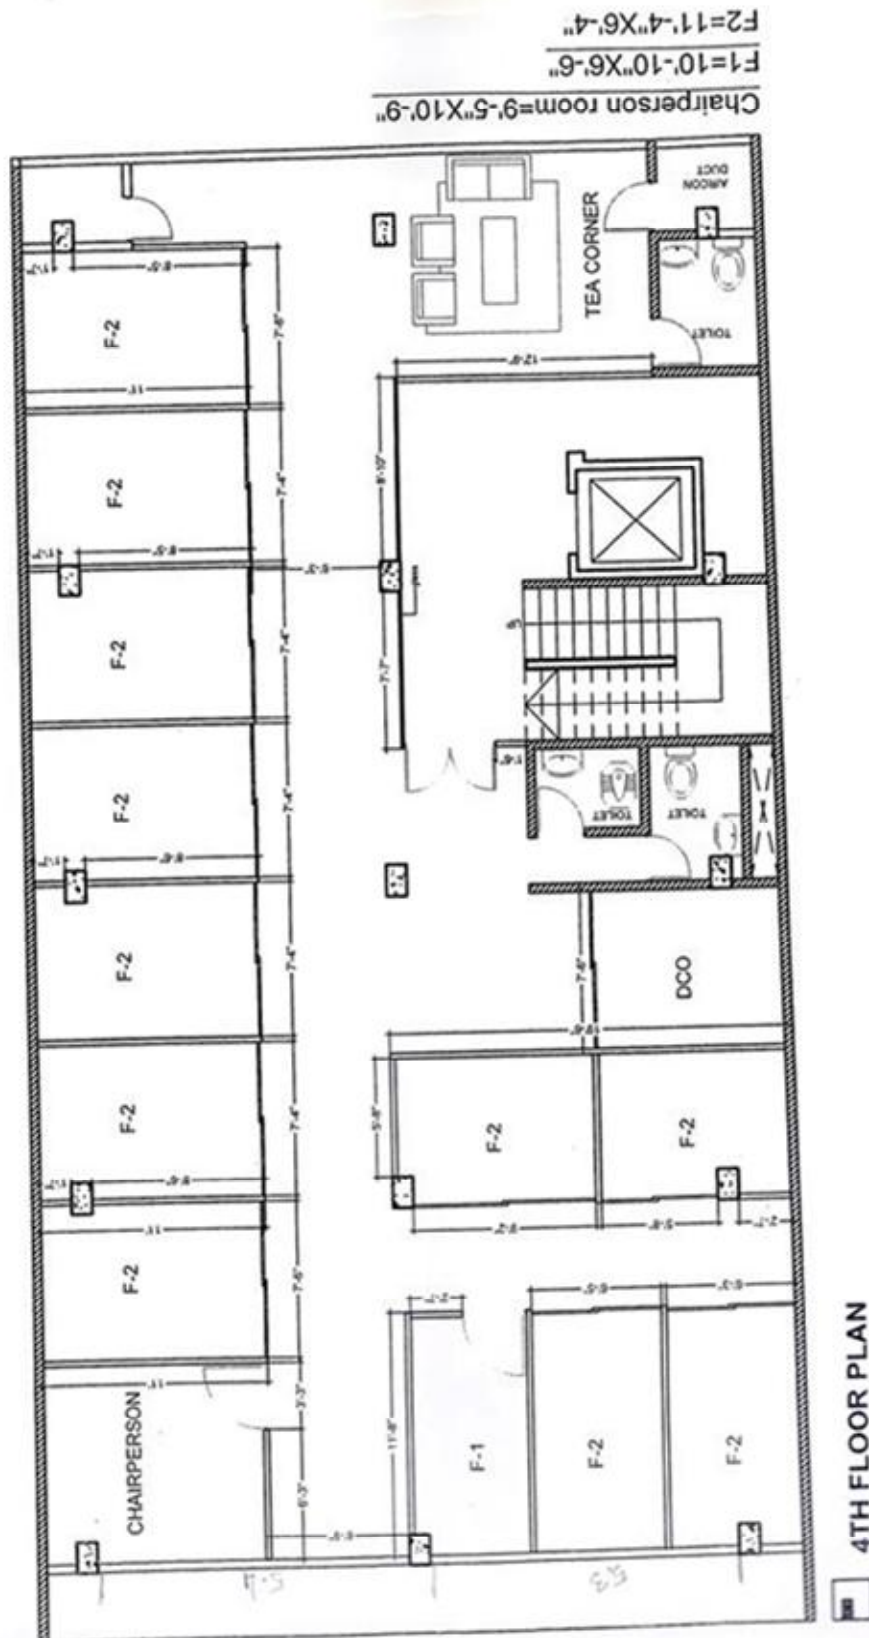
Floor Plan of BRAC University Building 5 4<sup>th</sup> Floor.
